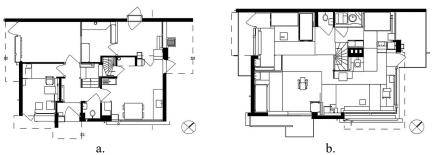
Schroder House: $a-1^{st}$ floor plan; $b-2^{nd}$ floor plan (source: https://web.archive.org/web/20140903064033/http://tartle.net/grivarius/blog/152-dom-shryoder-schroder-house/)
